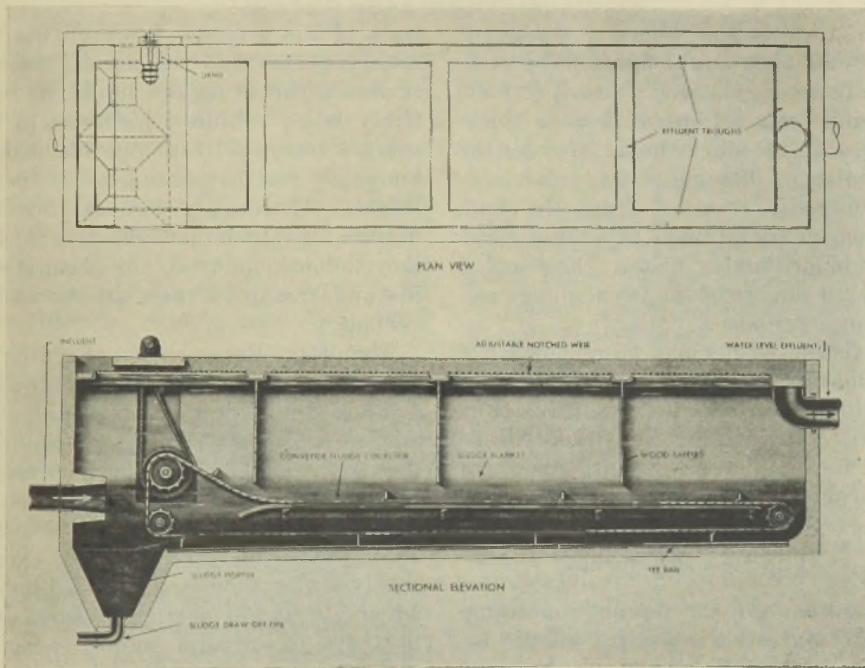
Plan and sectional elevation of Rex Verti-Flo Clarifier.
